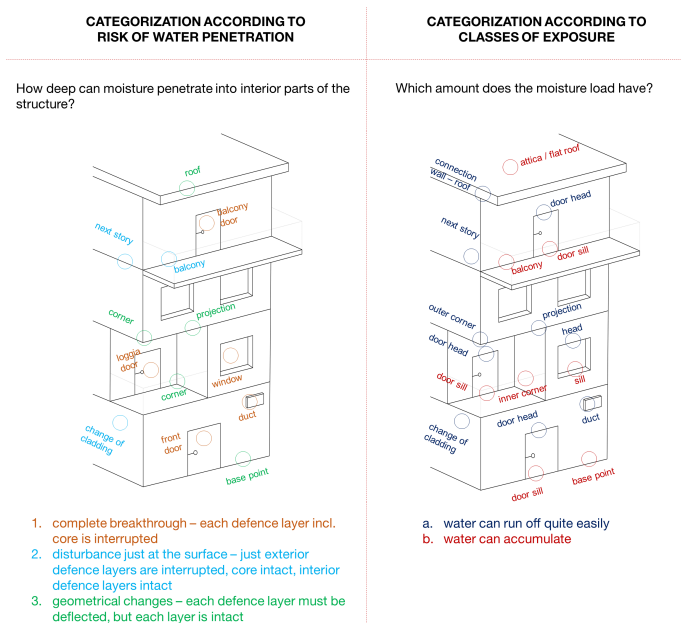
Categorization of façade details causing water run-off disturbance on exterior wall.
